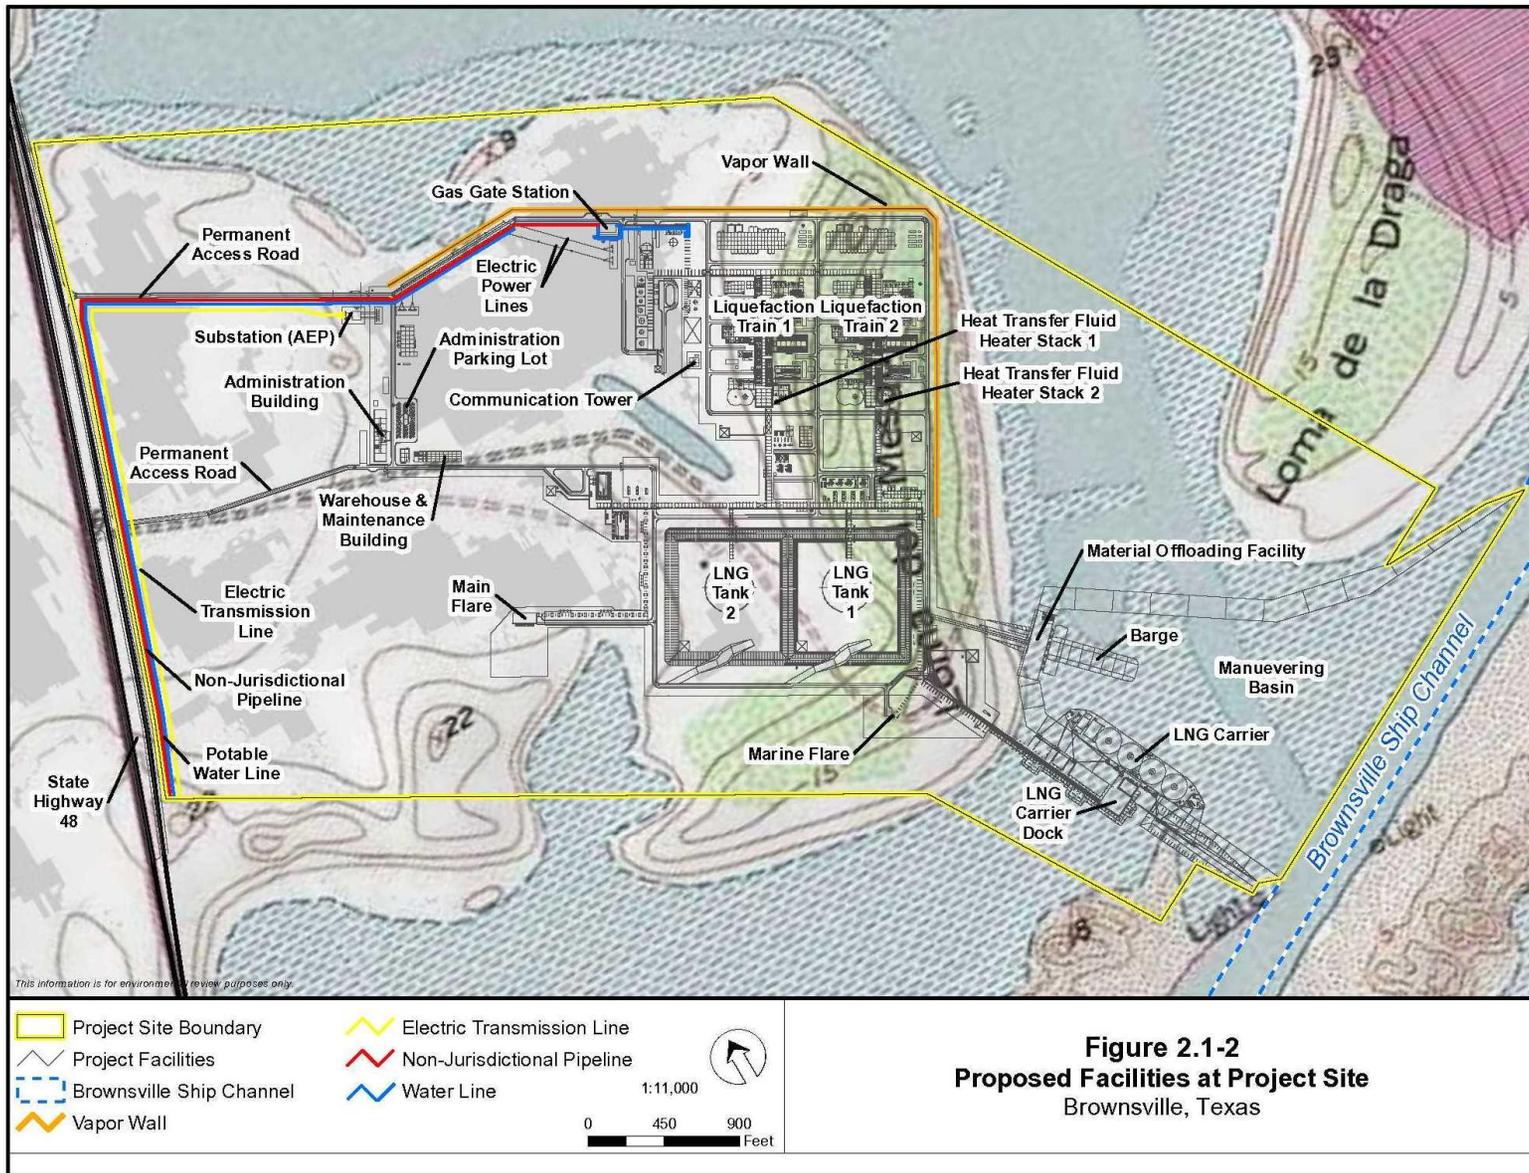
Proposed Facilities at Project Site (Topographic Map)
